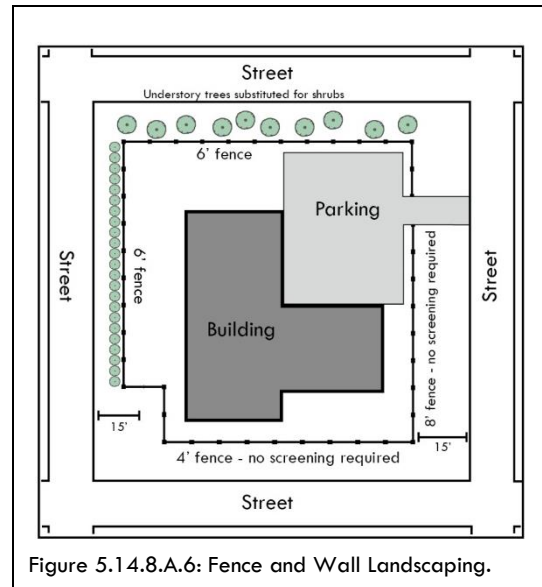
A.6: Fence and Wall Landscaping.
